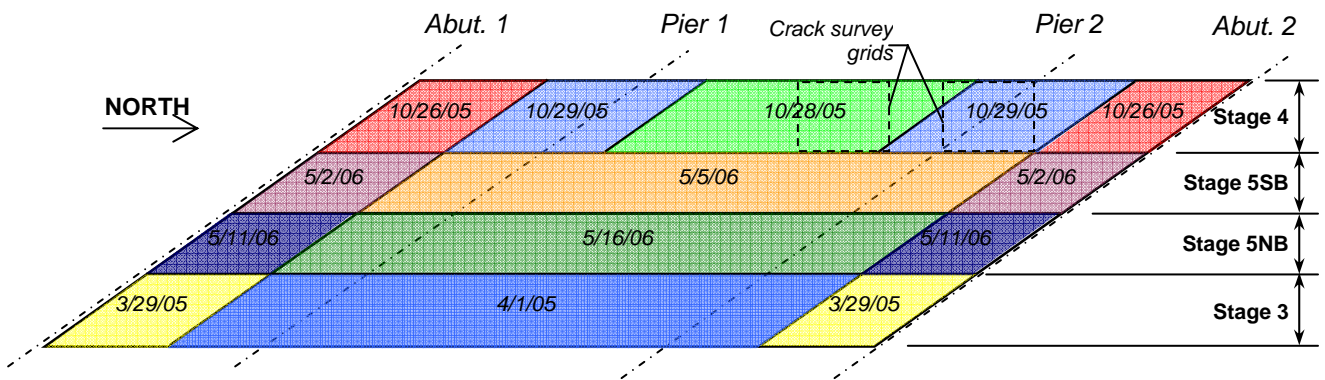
Plan view of rehabilitated bridge deck indicating locations and dates of concrete placement
